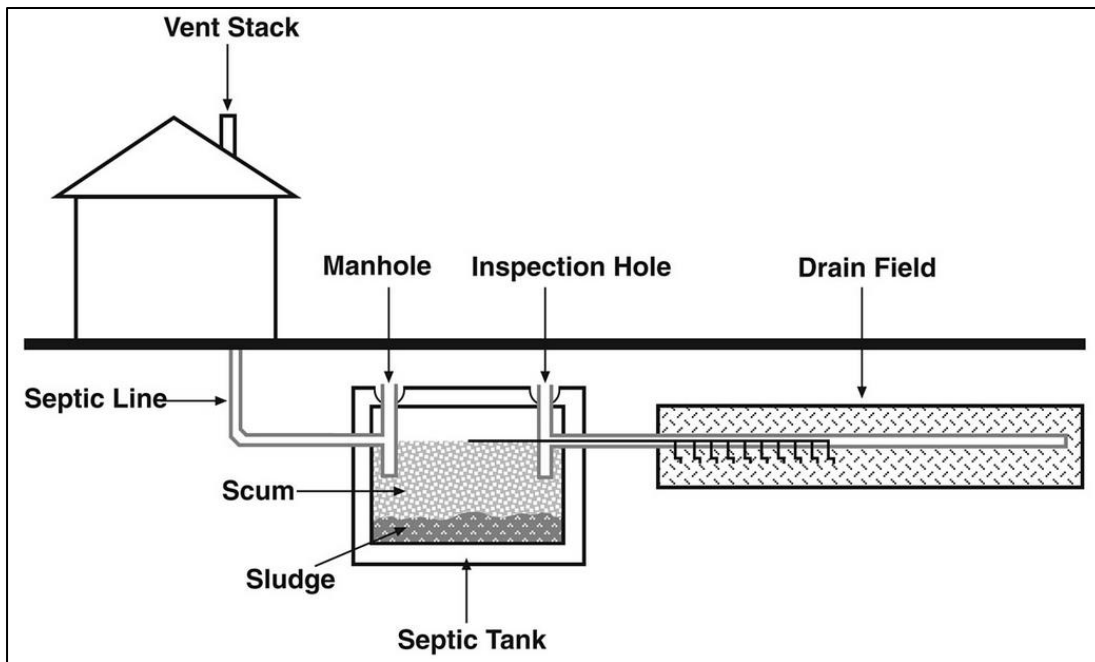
| CONCEPT OF PROPOSED SEPTIC SYSTEM FOR THE SITE
